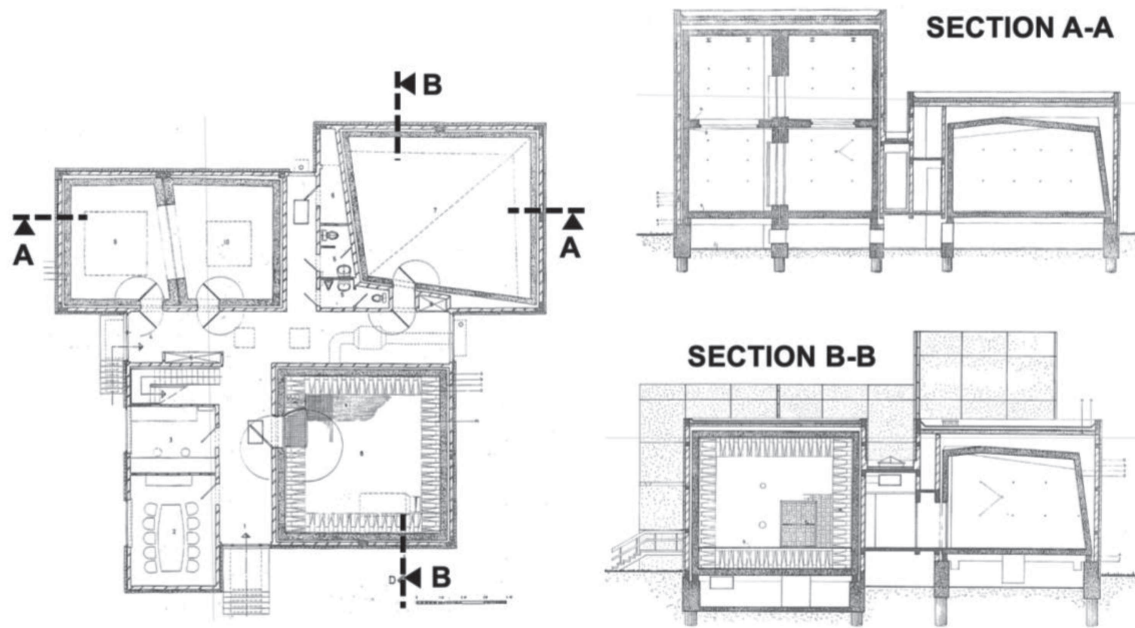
Ground plan cross-sections of the of the laboratory (1967).
